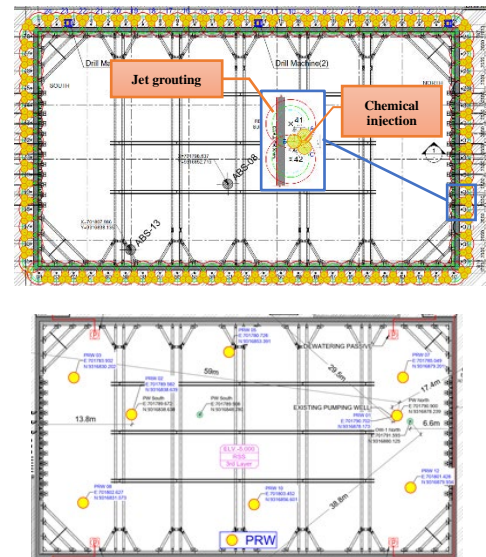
Layout plan of jet grouting and chemical injection and pressure relief wells (PRW)
